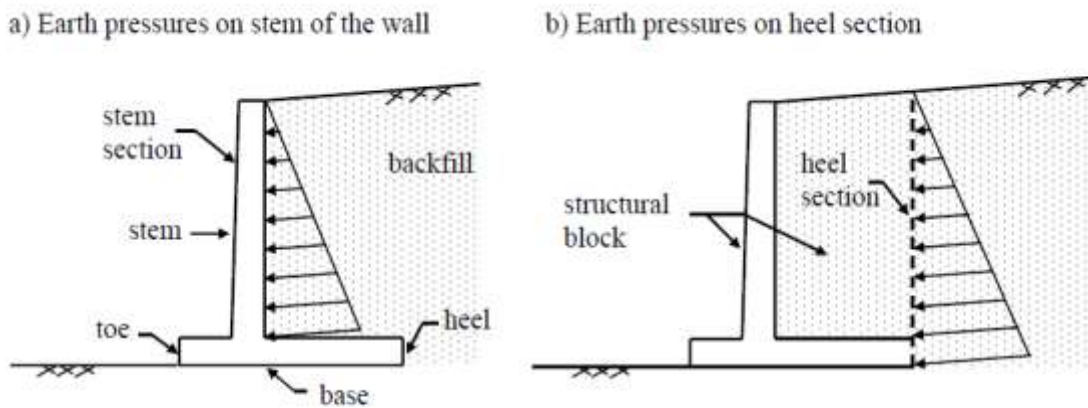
Sketch of design lateral earth pressures on cantilever retaining wall for a) internal stability and b) global stability.
